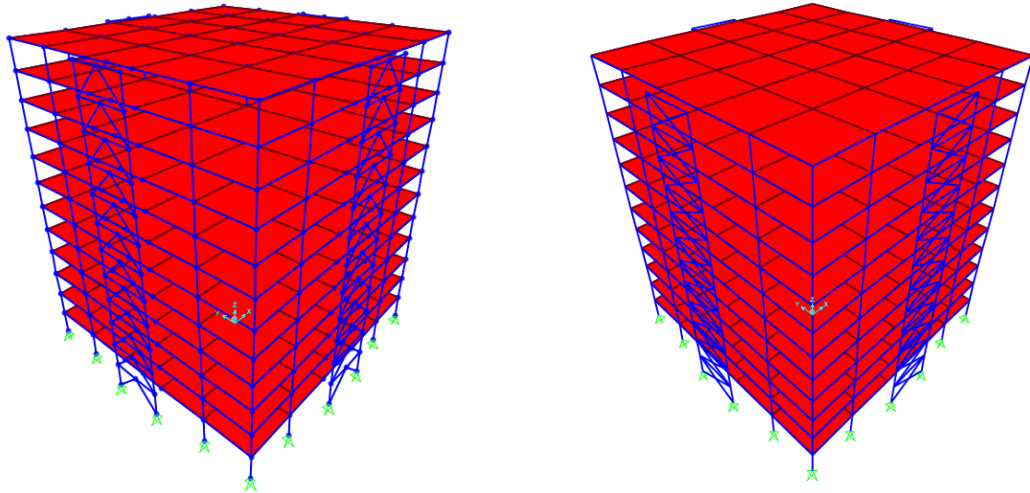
12-Story Strengthened Building Model with Inverted V- and X-Type External Steel Braces
